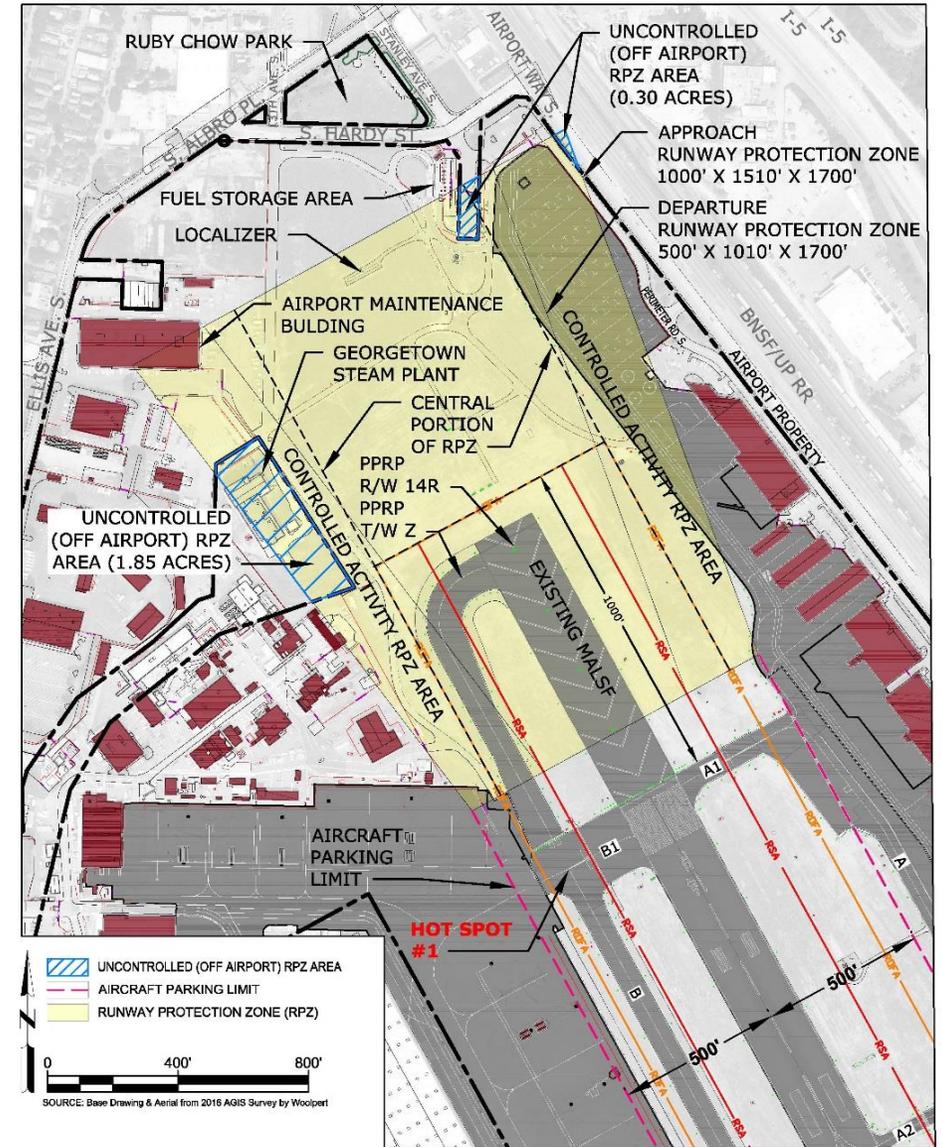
RUNWAY 14R INSTRUMENT APPROACH PROCEDURE/ RUNWAY PROTECTION ZONE DETAIL (Alternative One)
